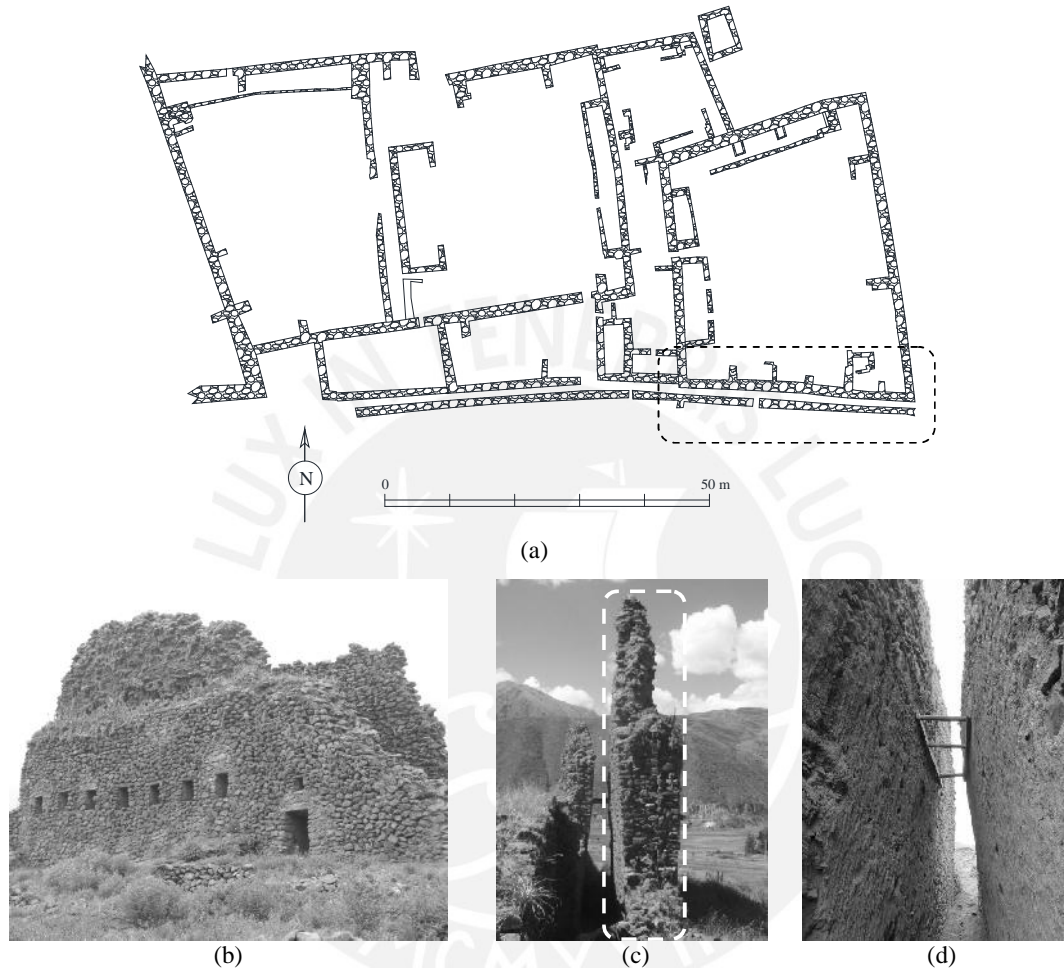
General views of the studied area: (a) plant view of the studied sector (McEwan et al. 2005); (b) elevation view of the instrumented wall, (c) section view; and (d) detail of the connection timber struts
